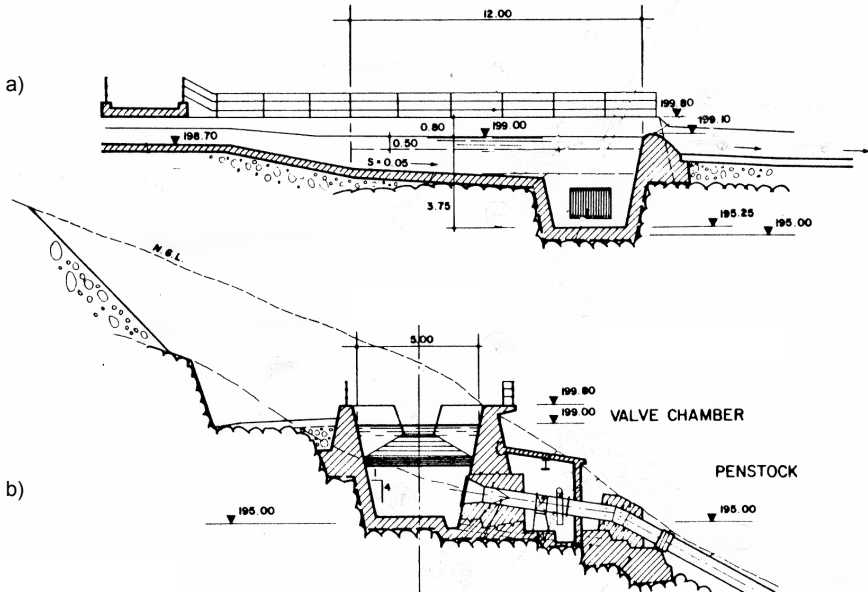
An example of forebay design [5]: a) Profile; b) section
